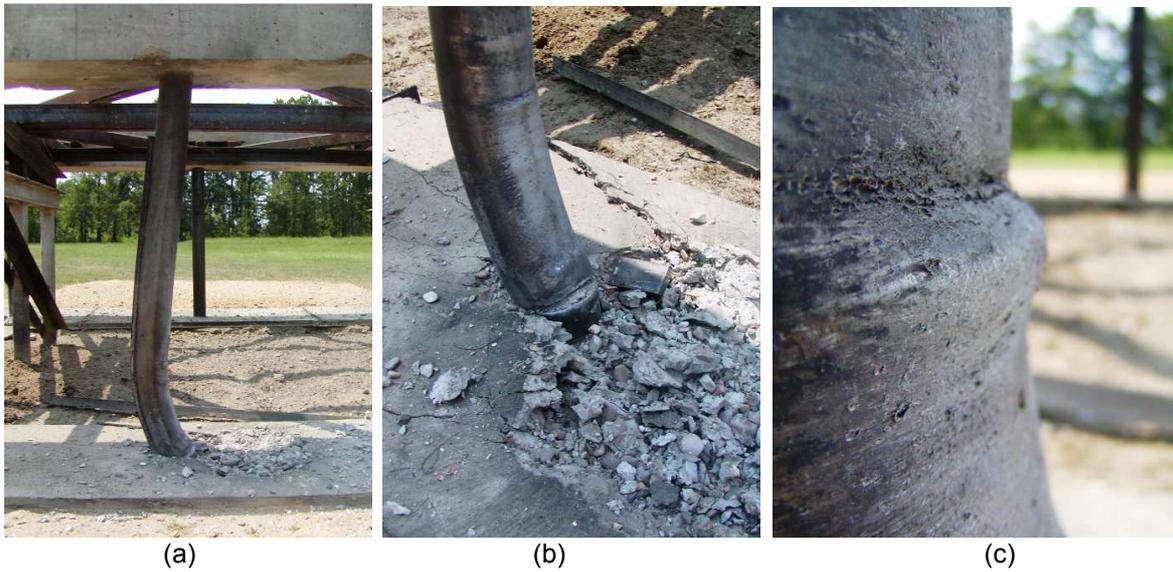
Specimen after extreme blast (charge at credible threat height): (a) column deformation (b) foundation (c) buckling.
